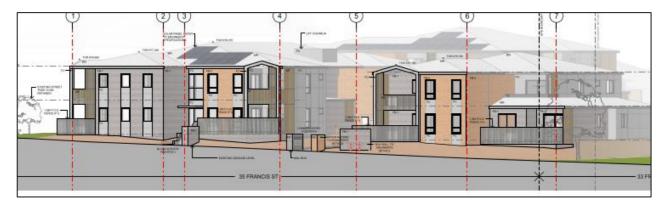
Extract from Architectural Plans – Francis Street Block A Streetscape Perspective (Source: DEM (Aust), dated 23/08/2024)
